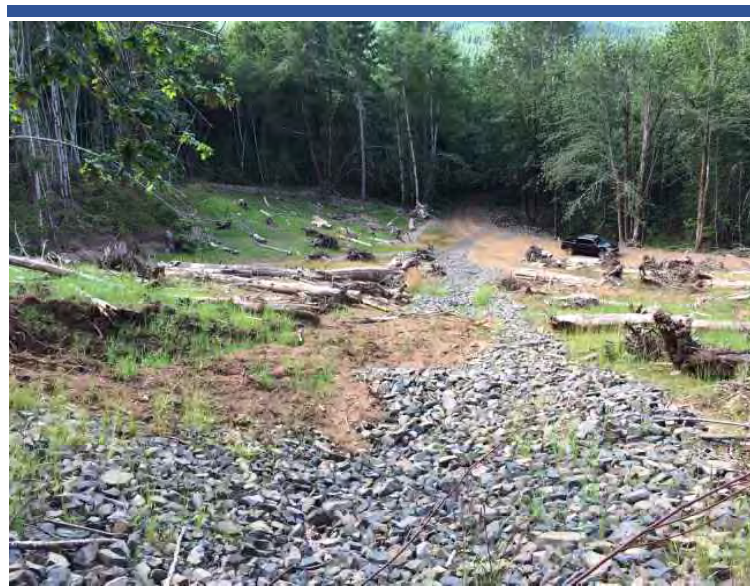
Looking downslope at main channel of Adit Creek seep at BS01, with material from left bank slope failure visible.
